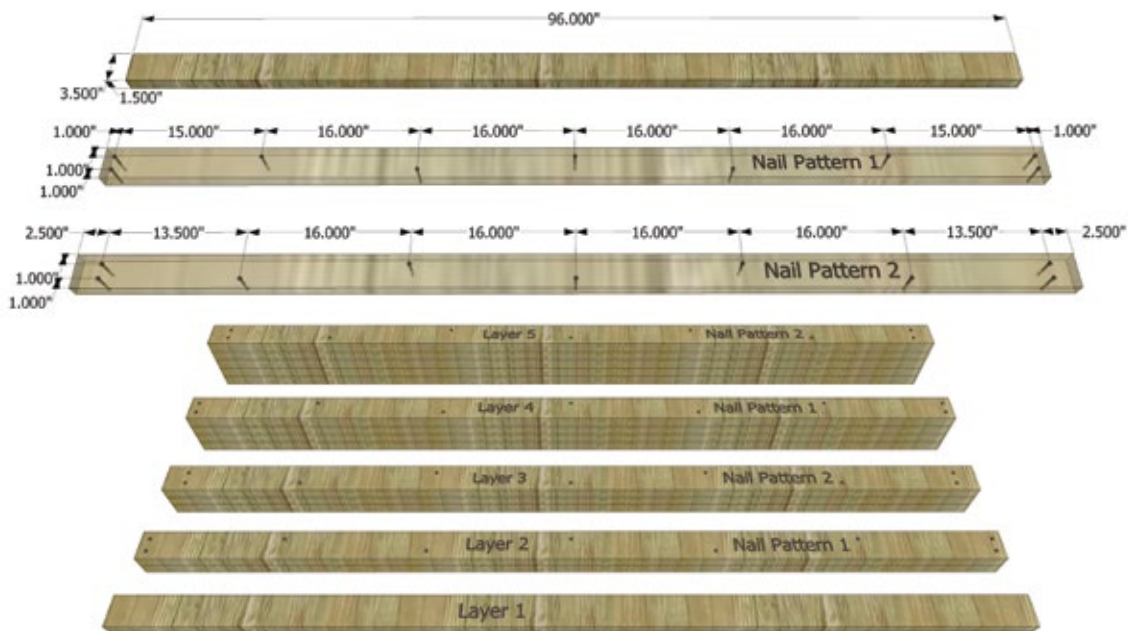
Repetitive nailing pattern for stacked 2 × 4 wall.
